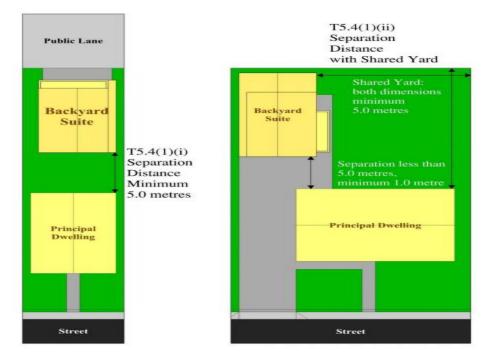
C.F2A: Setback from Primary Building for Dwelling, Backyard Suite"
